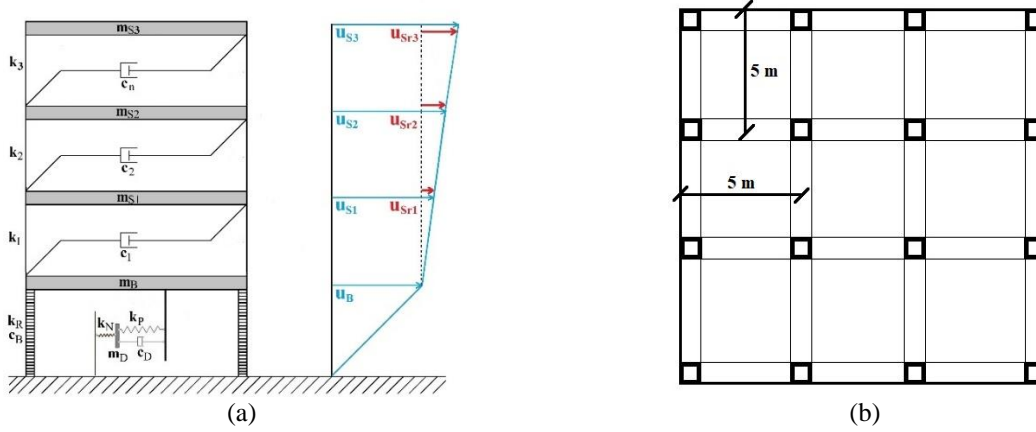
Examined 3-storey concrete building structure with the proposed absorption base system (KDAB), (a) sketch of the model and (b) typical ground floor plan of the structure.
